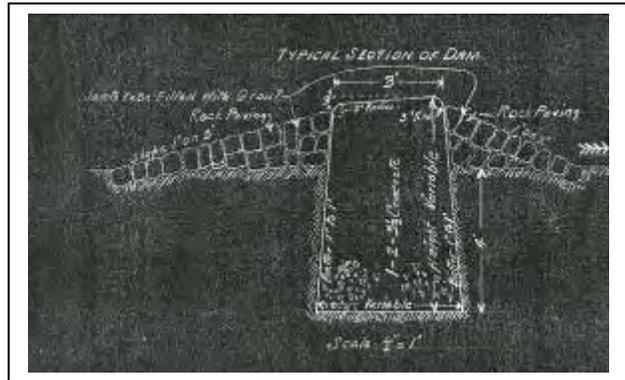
Cross section of preliminary dam design plans (Woodhull 1943) of on
